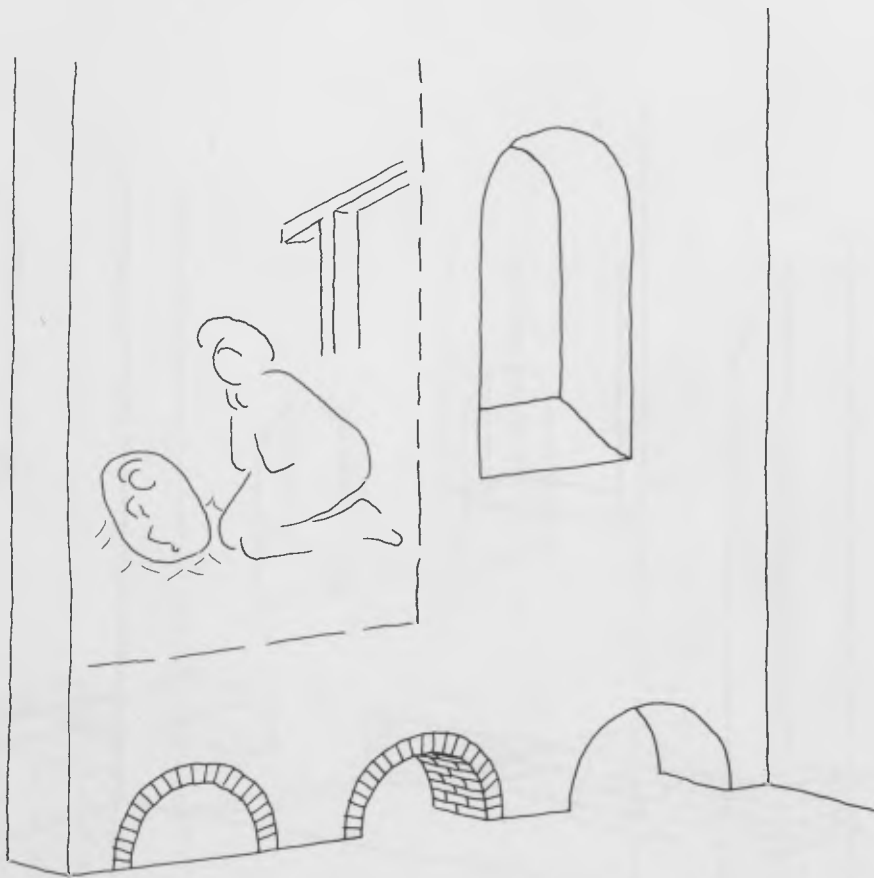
Reduction of the wall's absorbent surface and construction of small reinforcing and isolating arches.
